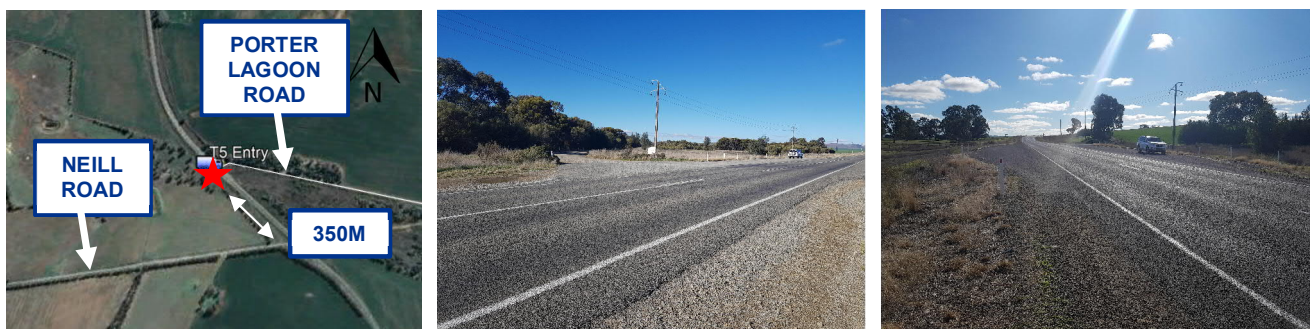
Aerial image of proposed T5 access point location (left) (Google Earth 2018). Street view looking south-east along the Barrier Highway (middle, left) (pictures taken in 2019).
